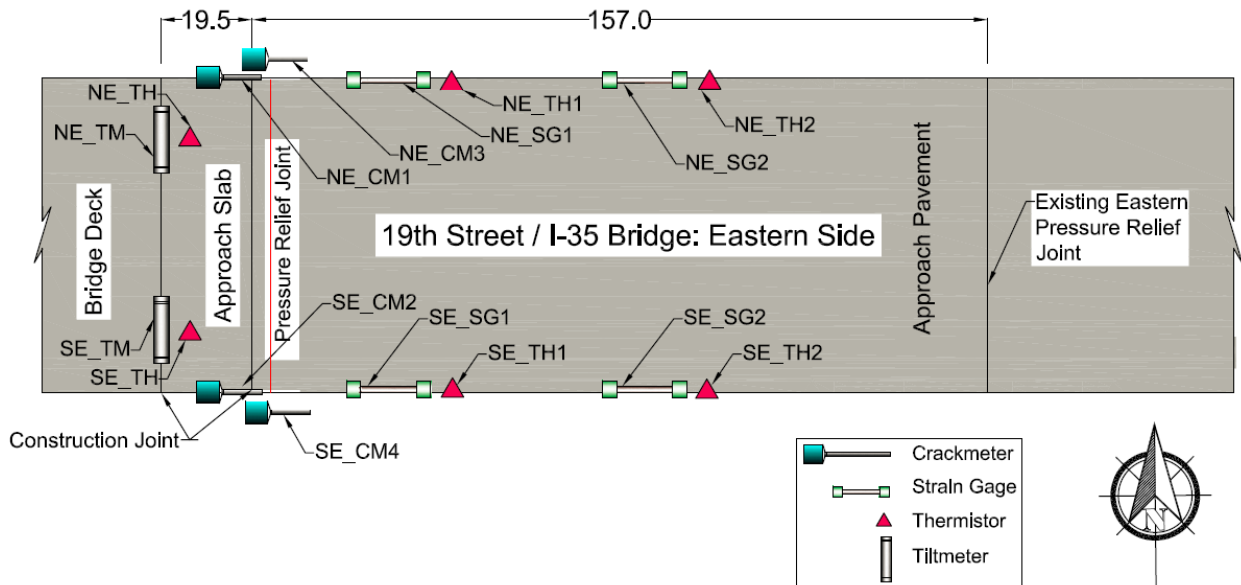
Instrumentation layout for the eastern side of the 19th Street/I-35 Bridge after repairs
